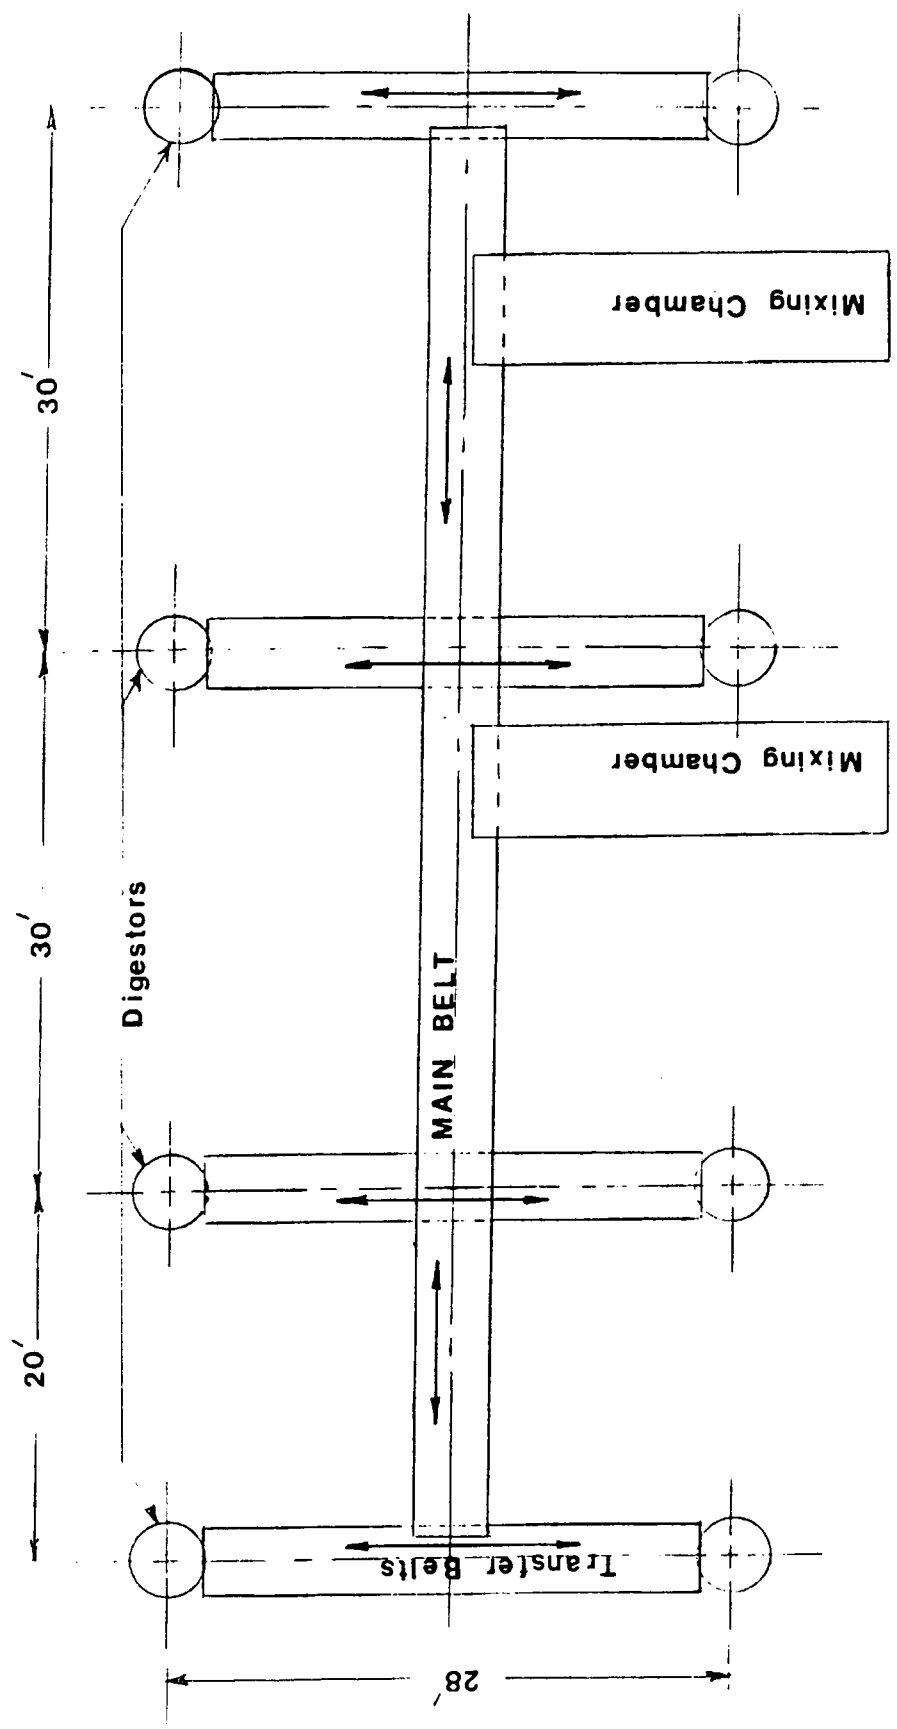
A Layout Showing Position of Belt Conveyors and Digestors.
